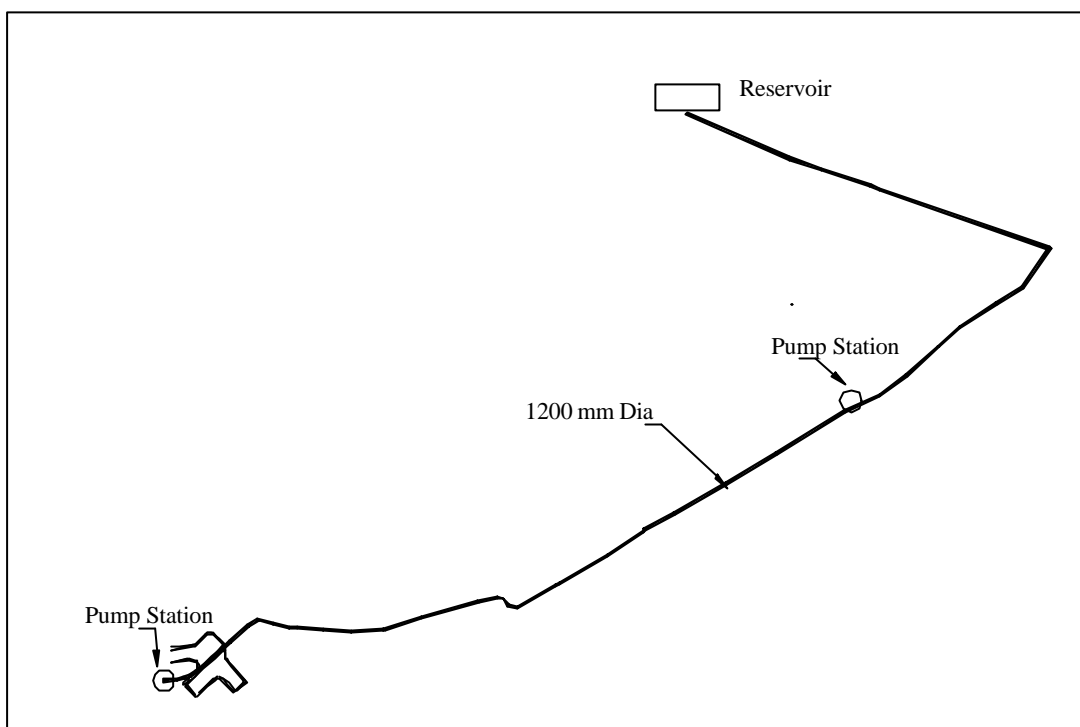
Layout of HL#4 pumping, conveyance and storage system
